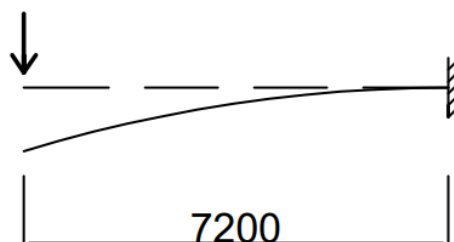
Corner column removed, single span beams supported by rigid connections
